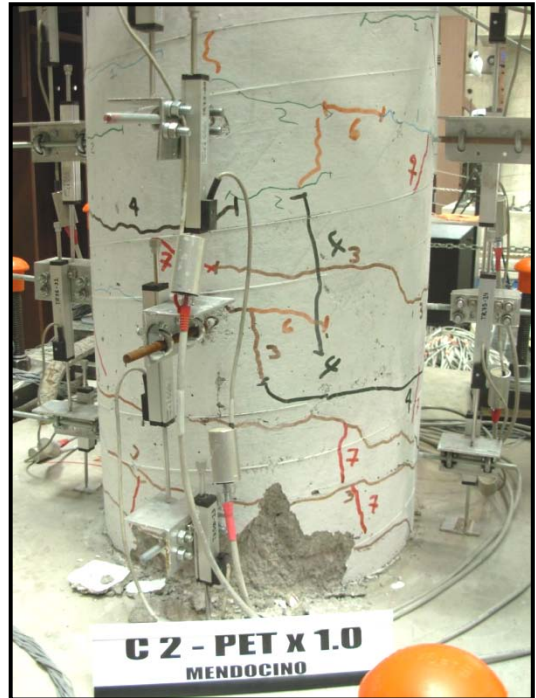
First Concrete Spalling Specimens C2 (PETx1.0)
